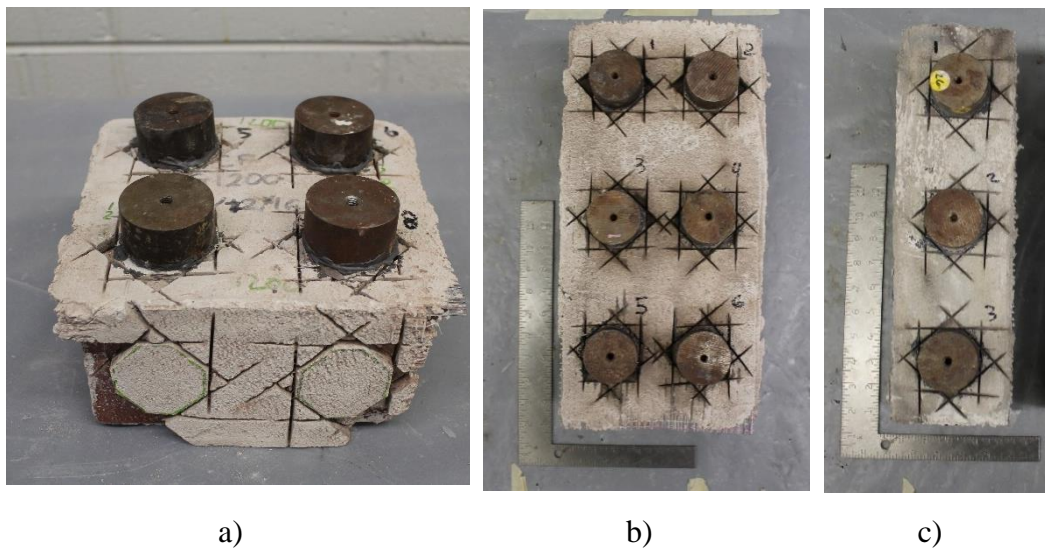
Steel disks attached on a) clay brick, b) concrete masonry unit and c) concrete block
